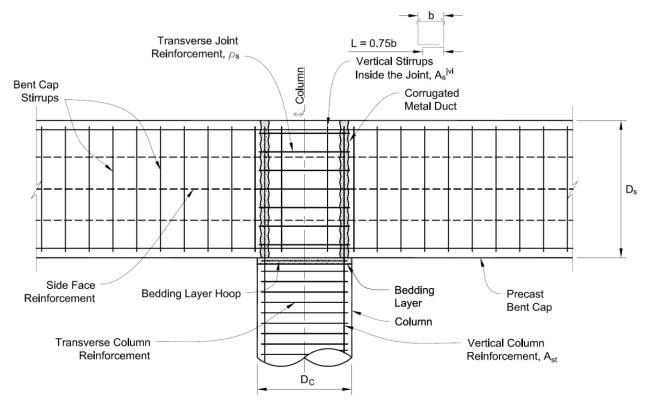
Grouted Duct Joint Shear Reinforcement Details (Elevation)—SDC B
